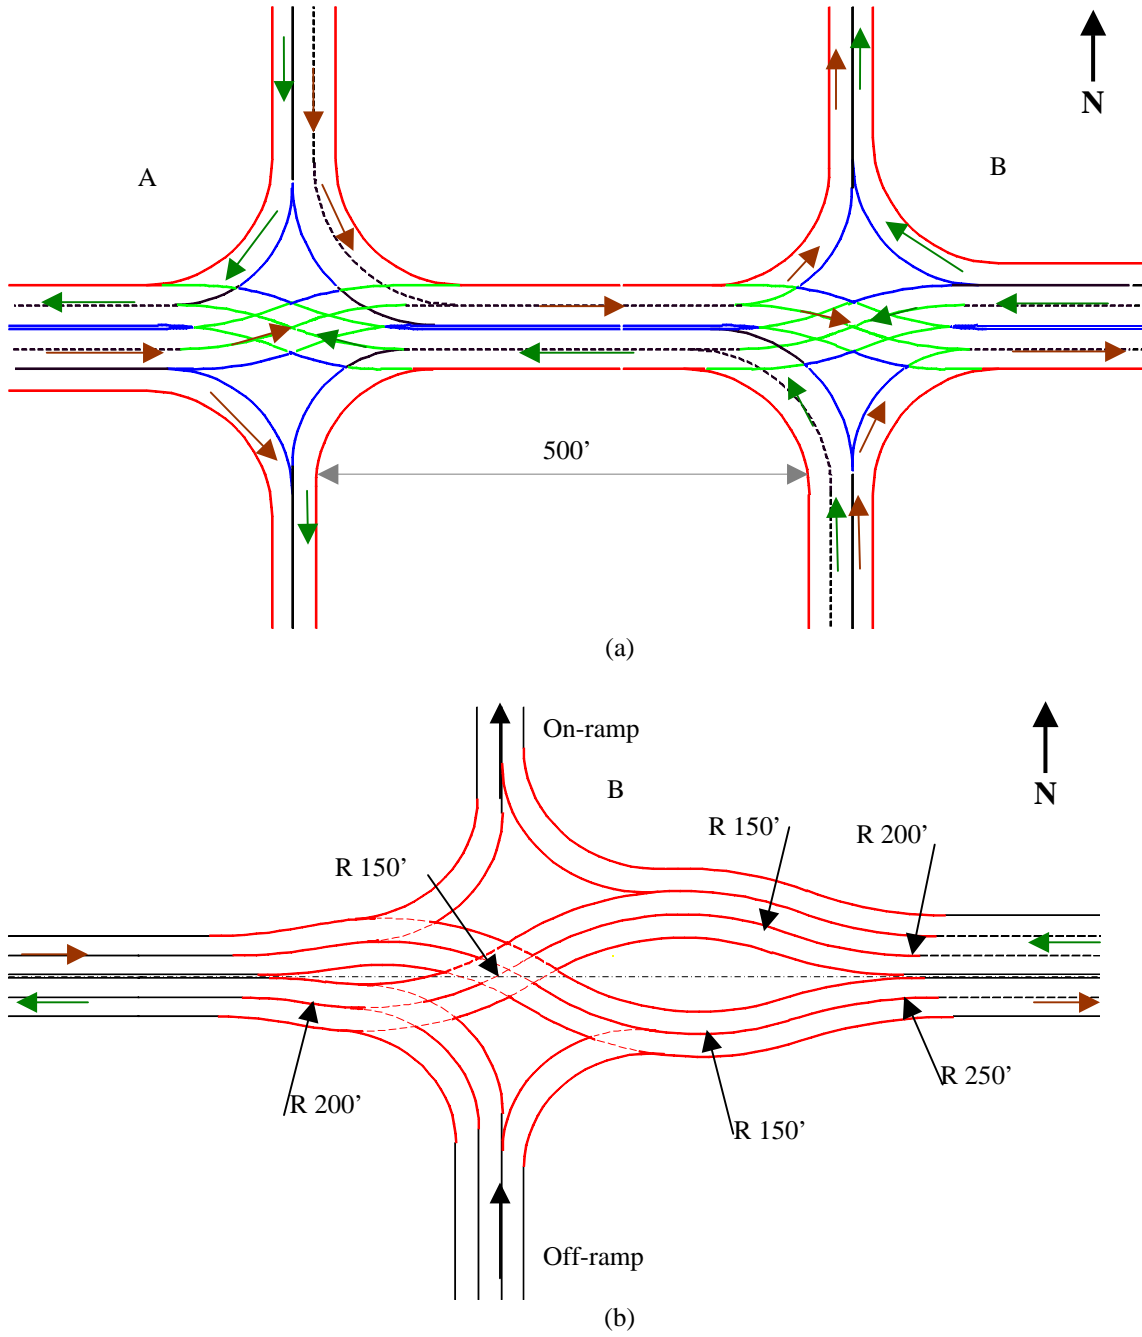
(a) Typical layout of a Diverging Diamond Interchange layout; (b) Proposed geometric-improvements at the right side ramp terminal
